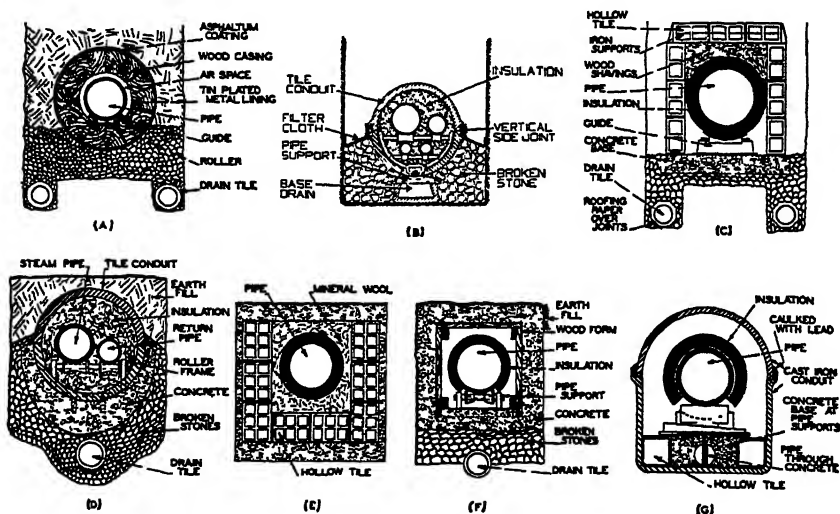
CONSTRUCTION DETAILS OF CONDUITS COMMONLY USED
